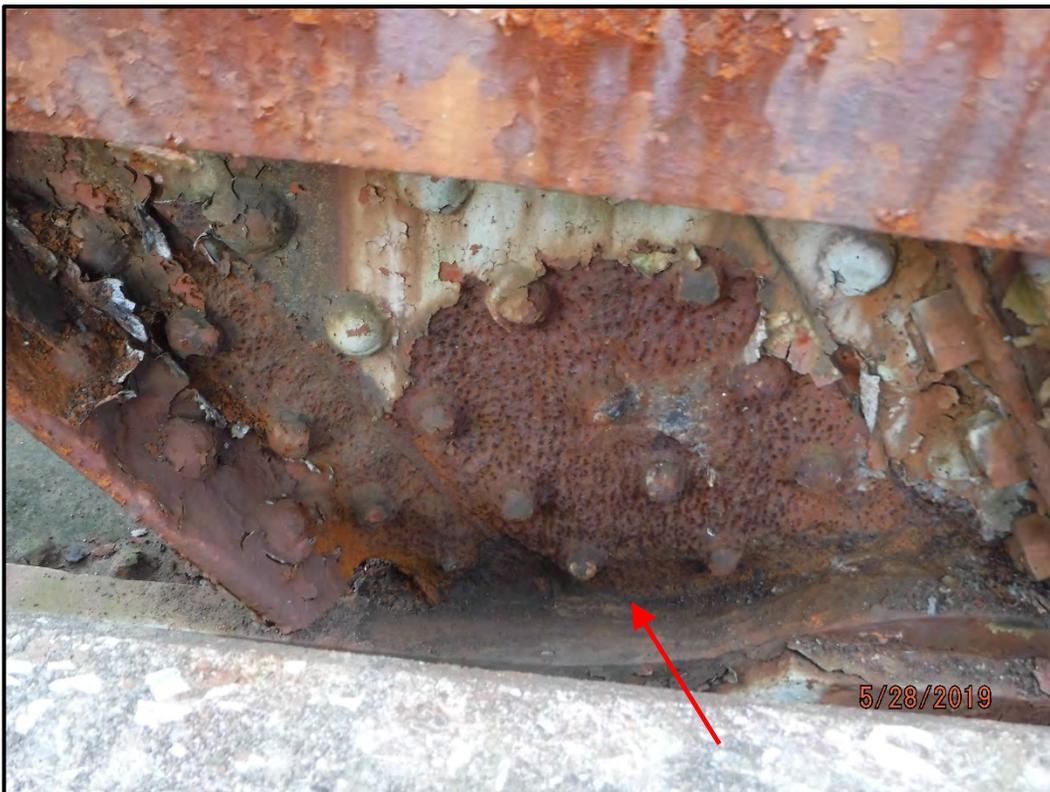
Pitting of the 3/4" stiffening plate on the inboard face of downstream truss member L0-U2 at panel point L0. Note the 50% section loss of the rivet heads directly above the eye bar.
